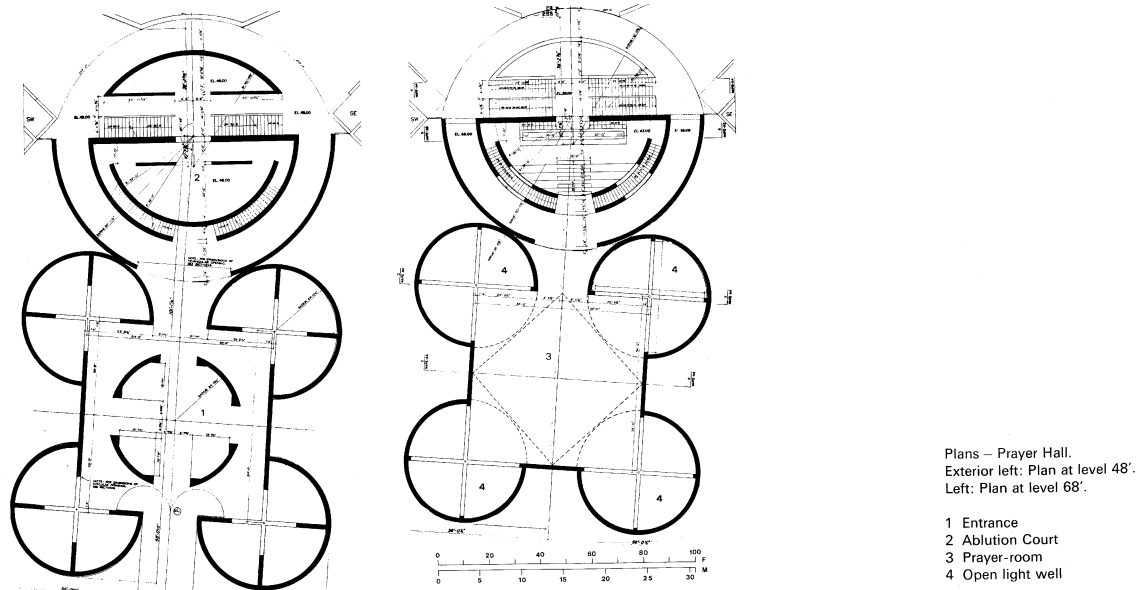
Louis Kahn, plan of prayer hall, showing axial disruption, Bangladesh Parliament Building, Dhaka, Bangladesh, 1962.
